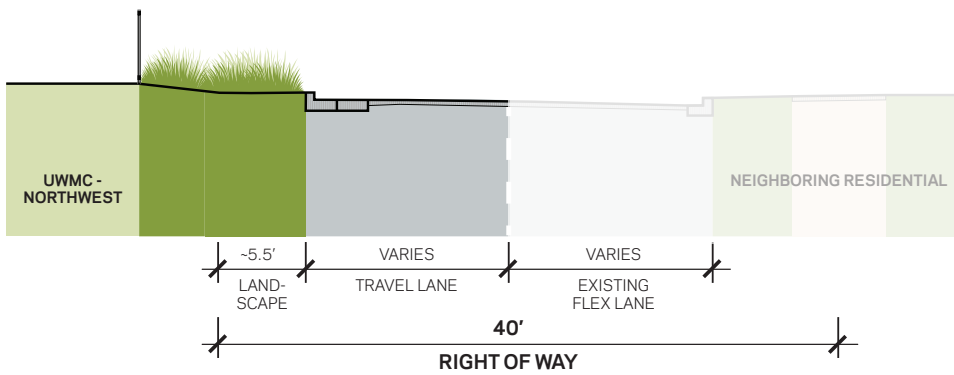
STREET SECTION AT BURKE AVE N - NORTHEAST CAMPUS EDGE
